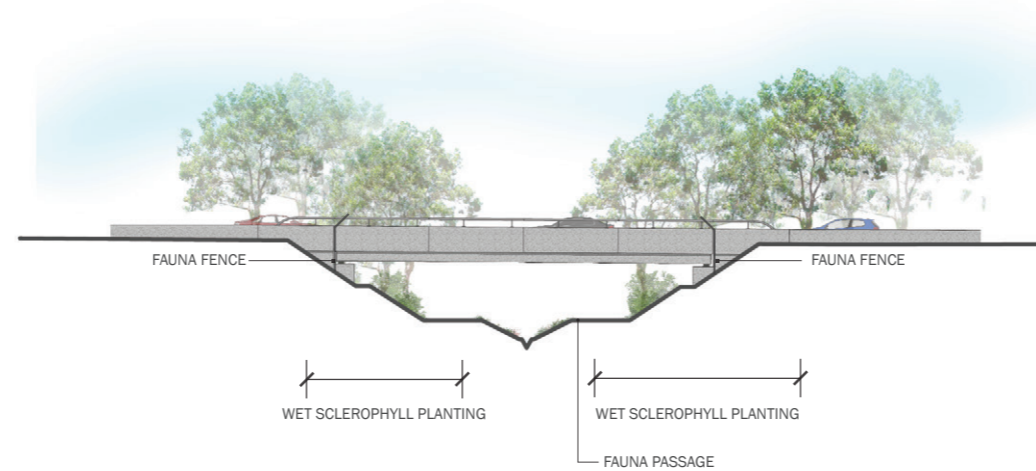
Elevation of typical fauna passage (Scale 1:400) Note: Fence locations and types are to be confirmed, and subject to further design development
